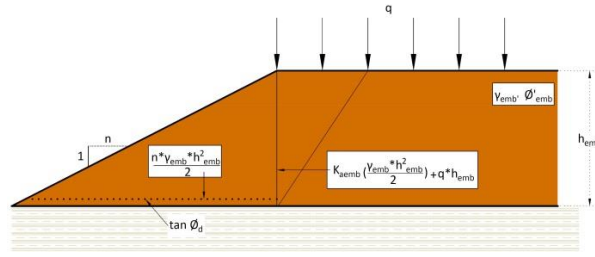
Sliding in an embankment (Almeida *et al*)
